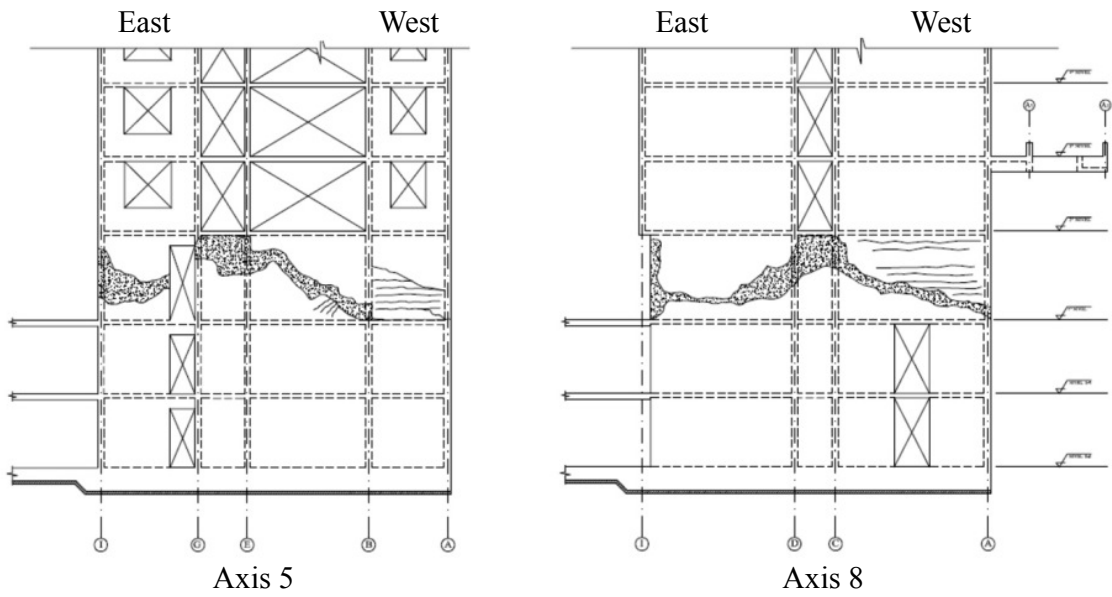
Sketch of damage on axes 5 and 8 (after IDIEM, 2010)
